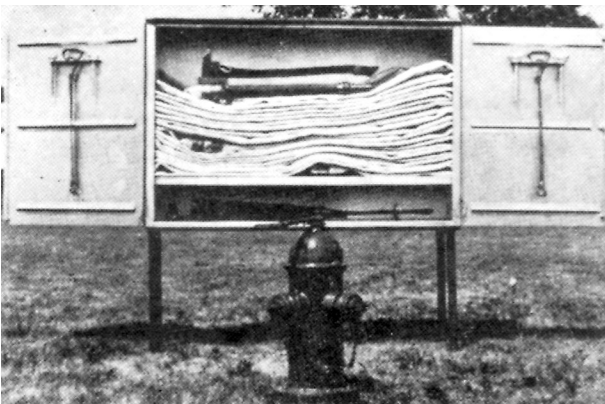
(c) Hose House That Can Be Installed on Legs, or Installed on Wall Near, but Not Directly Over, Private Hydrant.
